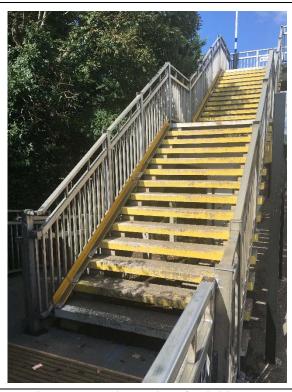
'Wheeling ramps' on steps at the stations footbridge.
